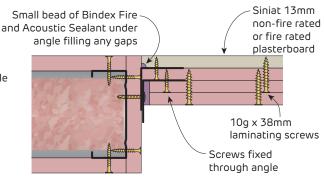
Laminated Vertical Shaft Transition to Steel Framed Partition Wall
